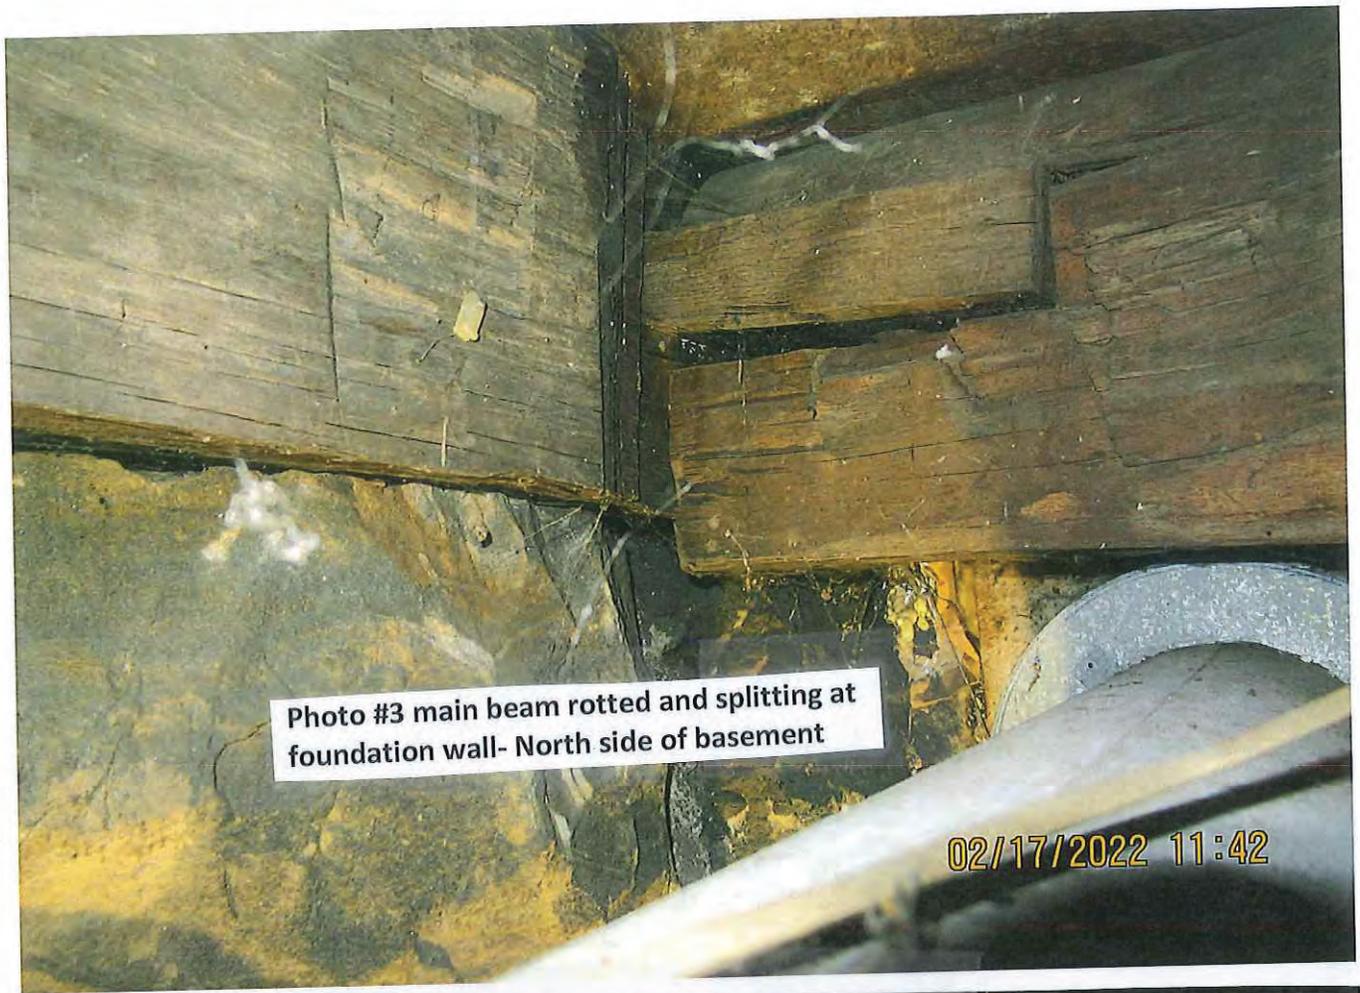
main beam rotted and splitting at foundation wall- North side of basement
